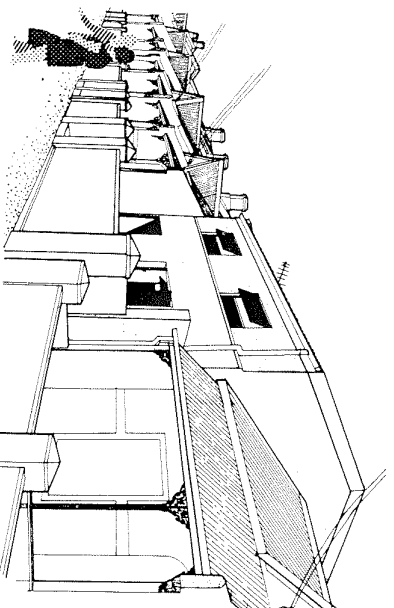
Unsympathetic new addition - the prevailing uniform building height and roof pitch have been disrupted
